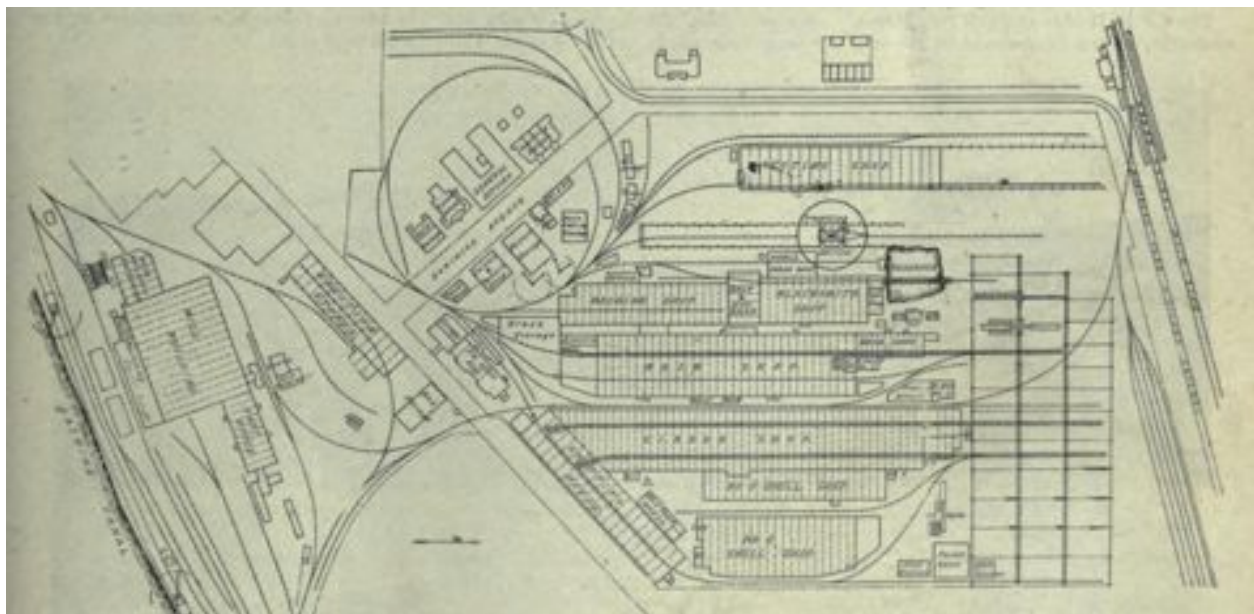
Ground floor plan of the Dominion Bridge Company, showing department layout of various plants. Source: “Dominion Bridge Co. Ltd., and Subsidiaries, Lachine, P.Q.” *Canadian Machinery and Manufacturing News* 7 (1916): 665-686. <http://www.archive.org/stream/canadianmachiner16torouoft#page/1109/mode/1up> (accessed April 2, 2013).
